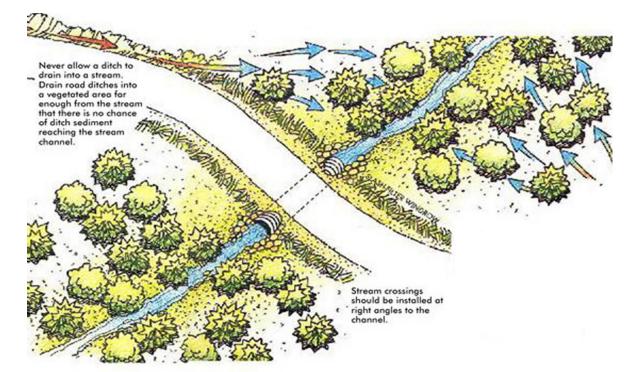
Culvert aligned at a right angle to stream, ditch water directed to vegetated and stabilized area
